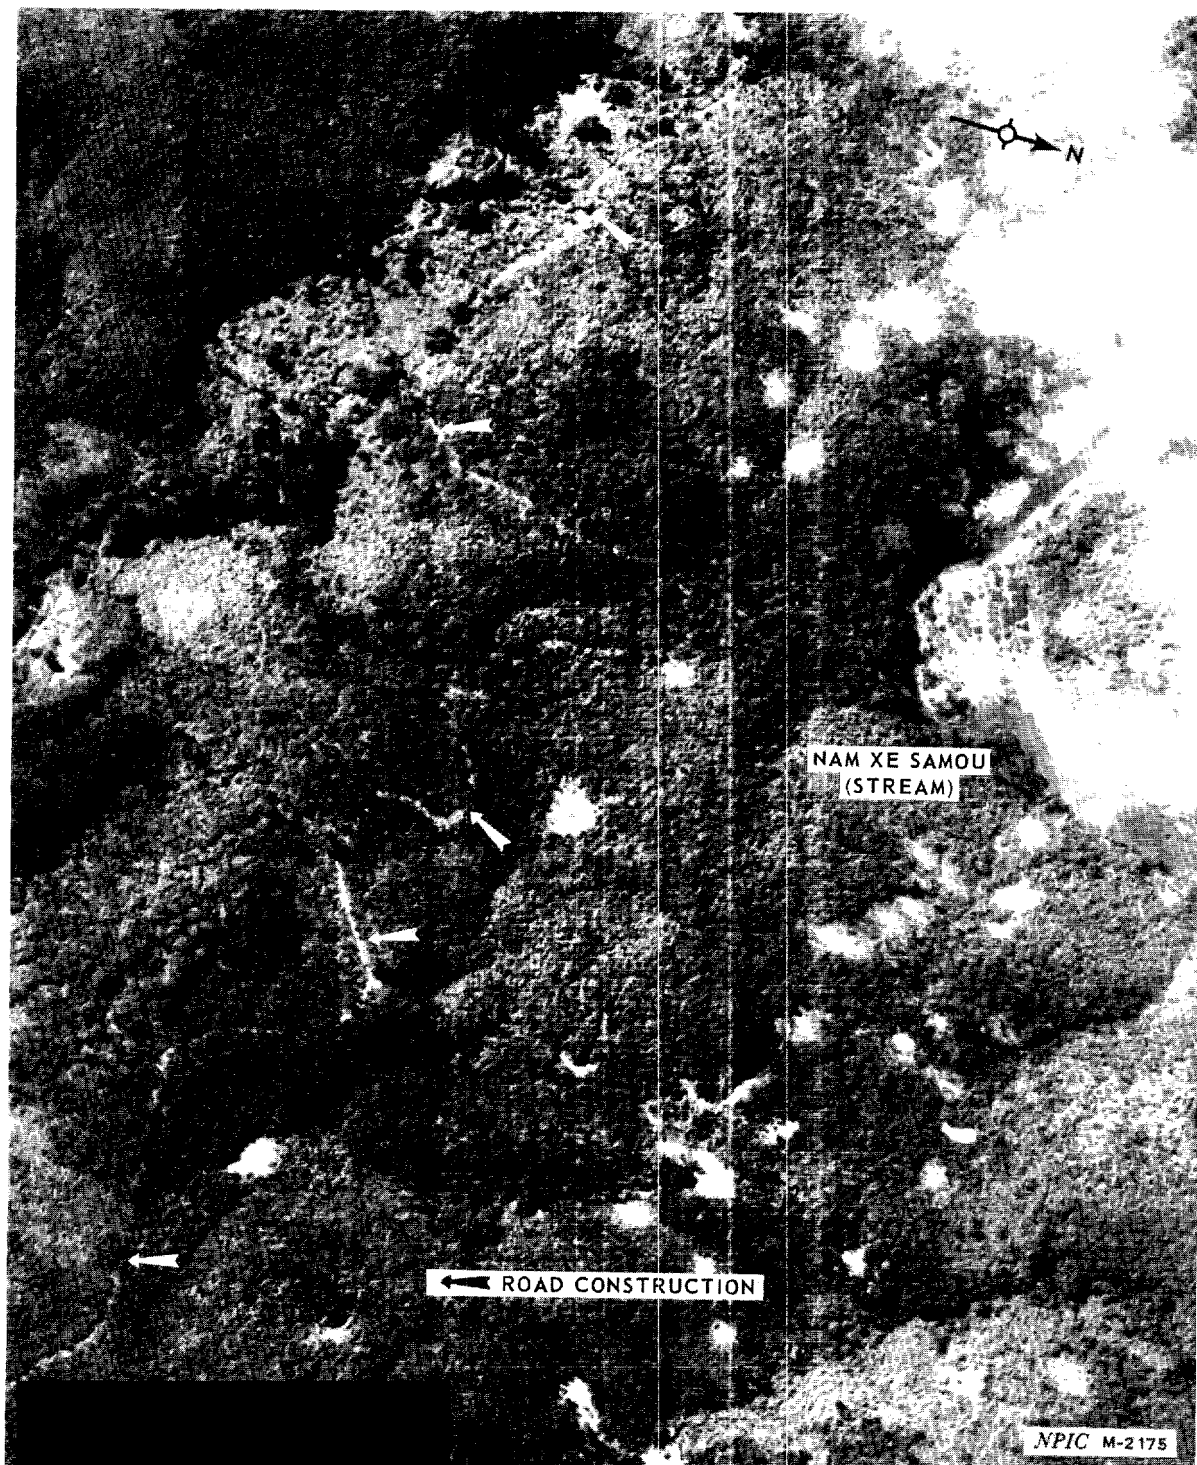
ROAD CONSTRUCTION, ROUTE 92 EXTENSION, LAOS
